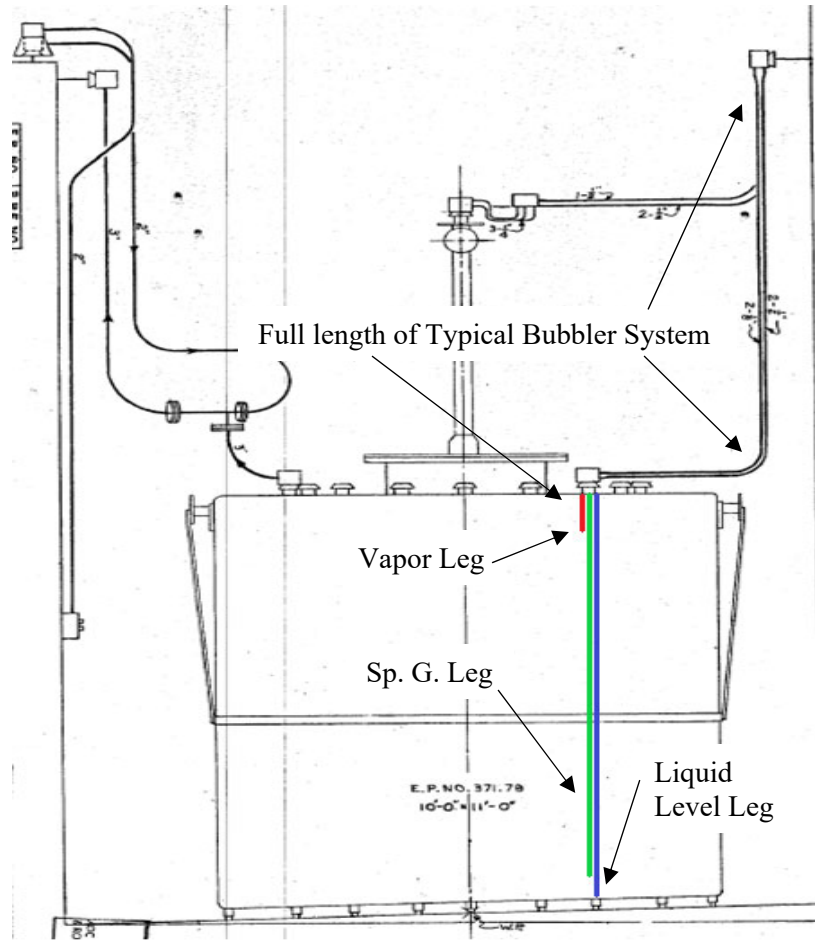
Typical Canyon Liquid Level Piping Arrangement.
